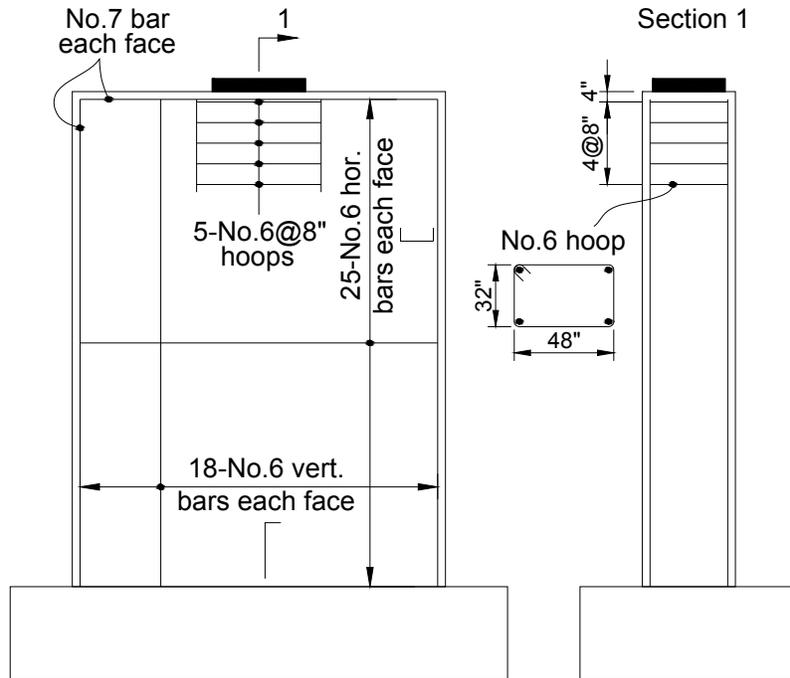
Reinforcement details of wall (footing reinforcement not shown).
